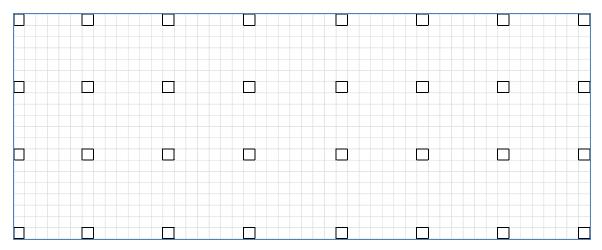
Column locations in a building footprint of 50-ft-by-20-ft with a one-way slab method of construction.
